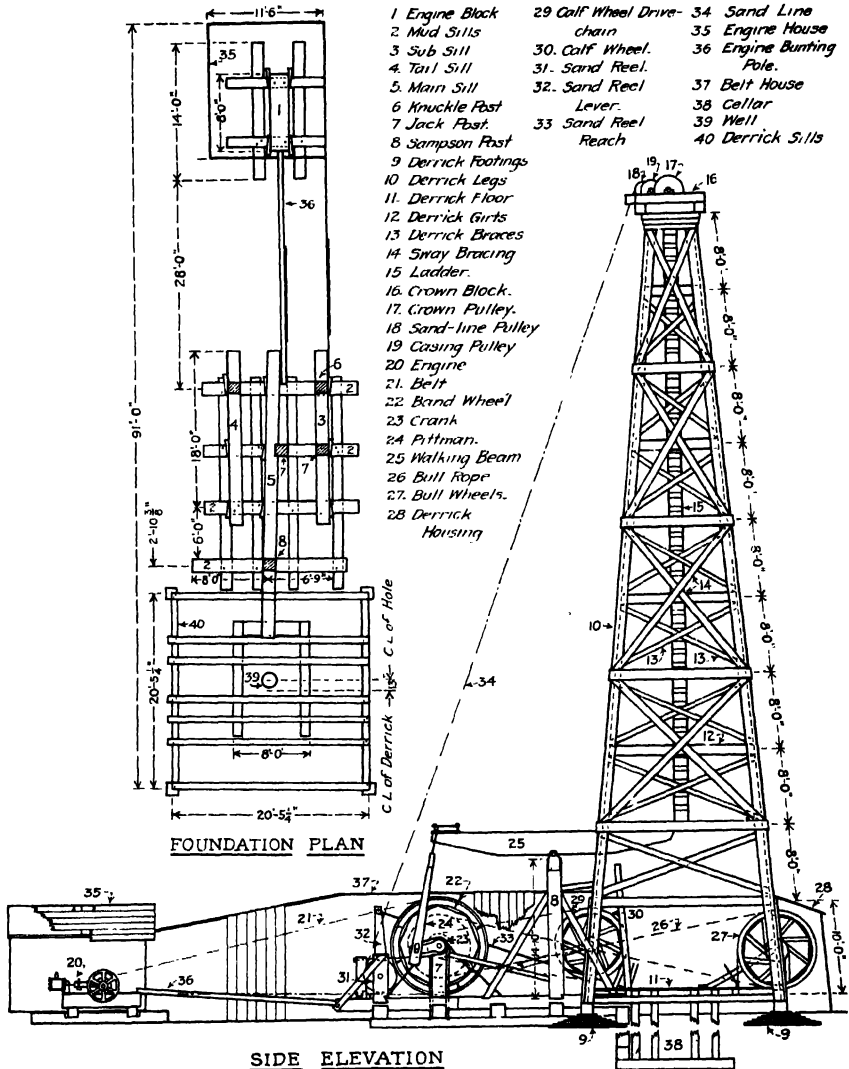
Plan and elevation of an 82-foot standard cable rig.
